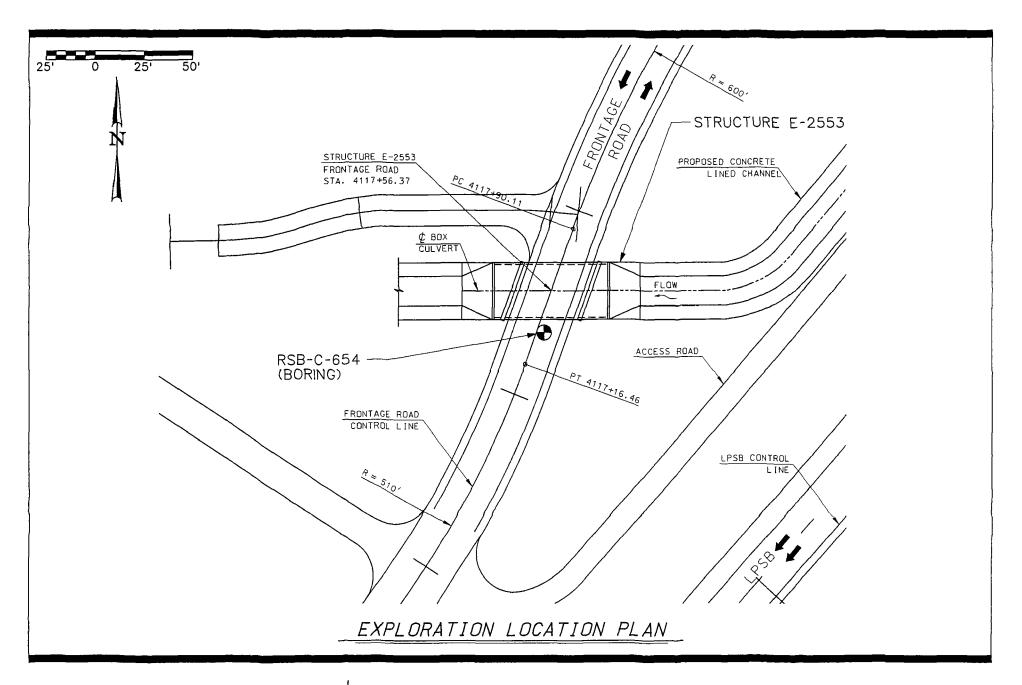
SITE PLAN & TEST HOLE LOCATIONS
